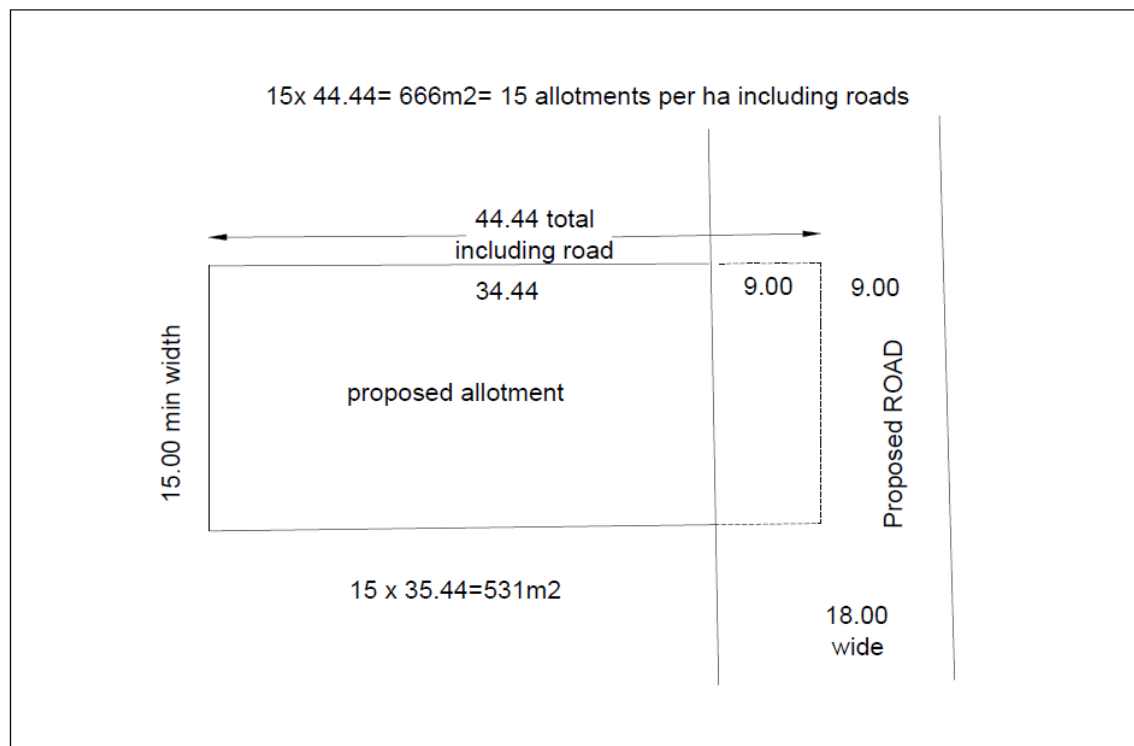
Complying Allotment, Proposed Waimakiriri District Plan General Residential Zone
